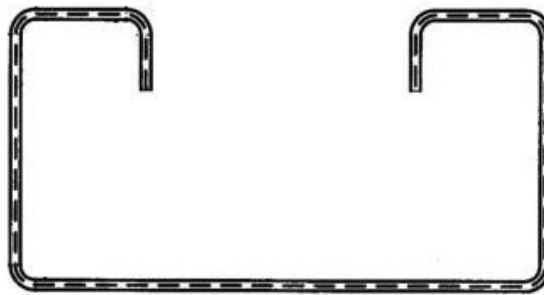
Configuration of the tested cross-section (Yan and Young, 2002)
